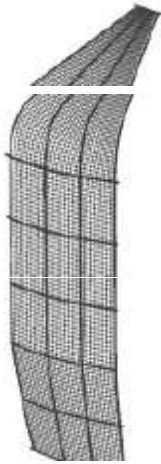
Welding the Rebars together to form the mold
